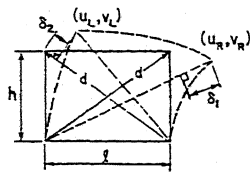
Deformation of Shear Wall Subjected to Lateral Load
